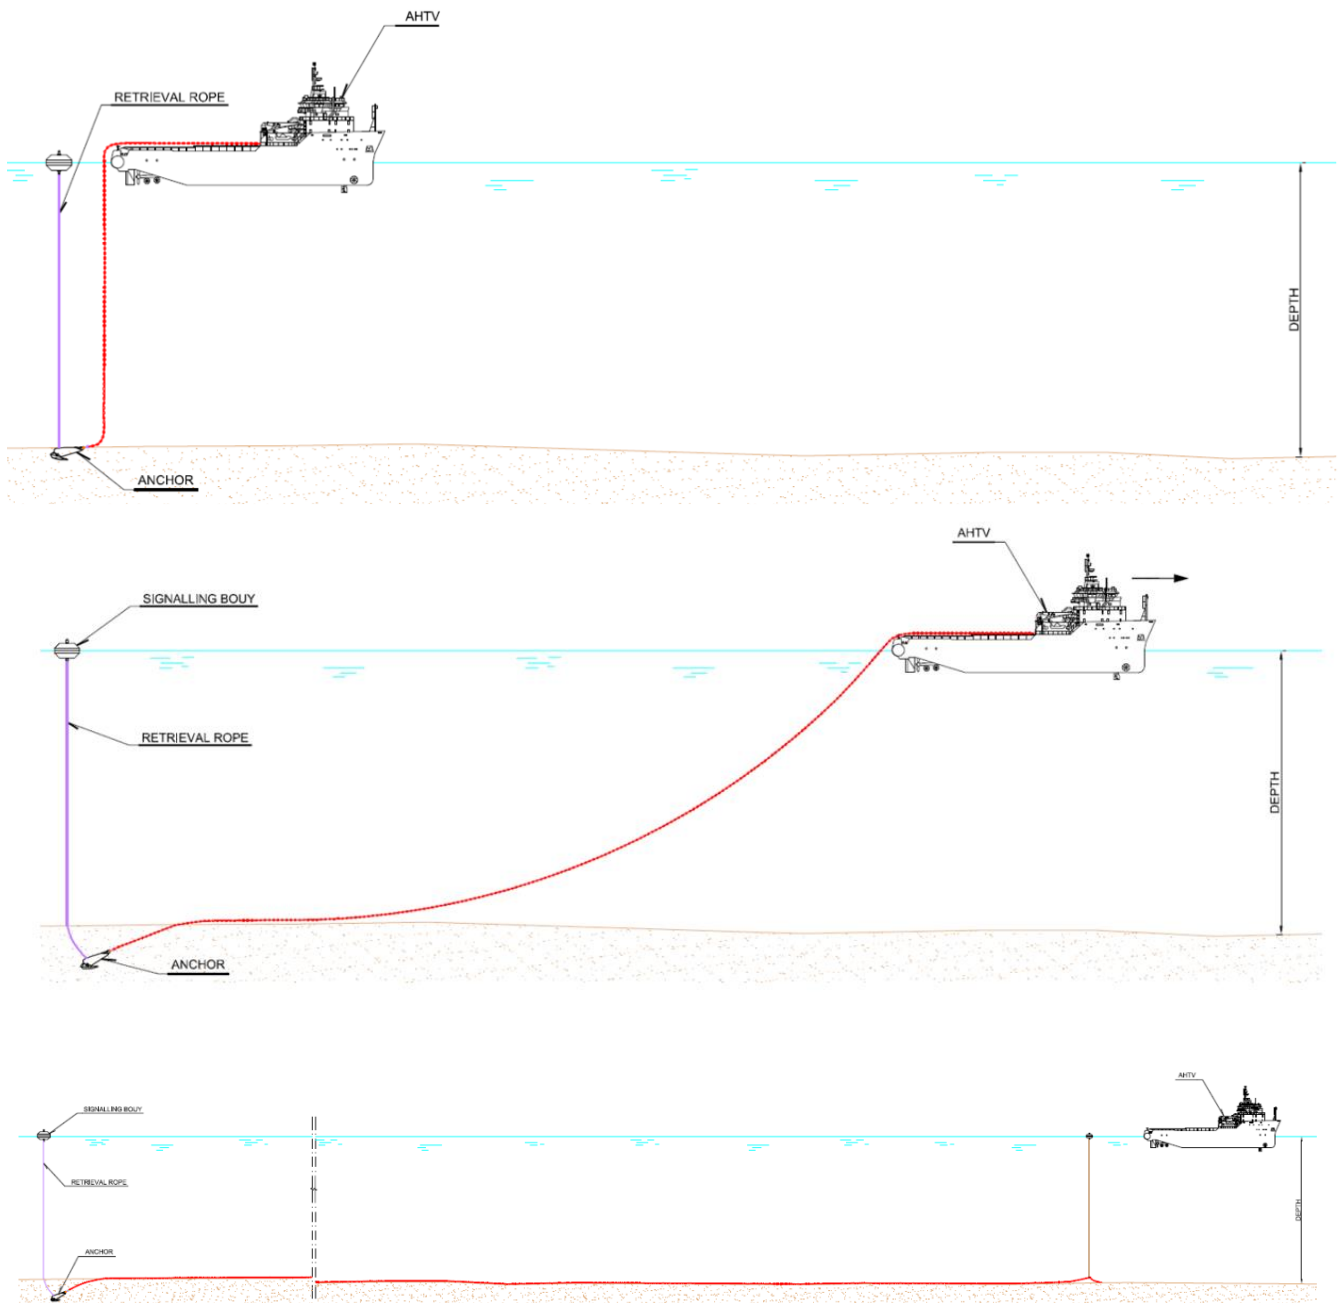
Overview of installation process for drag embedment anchors from the positioning of anchor (top) to the installation of anchor and chain (bottom)
